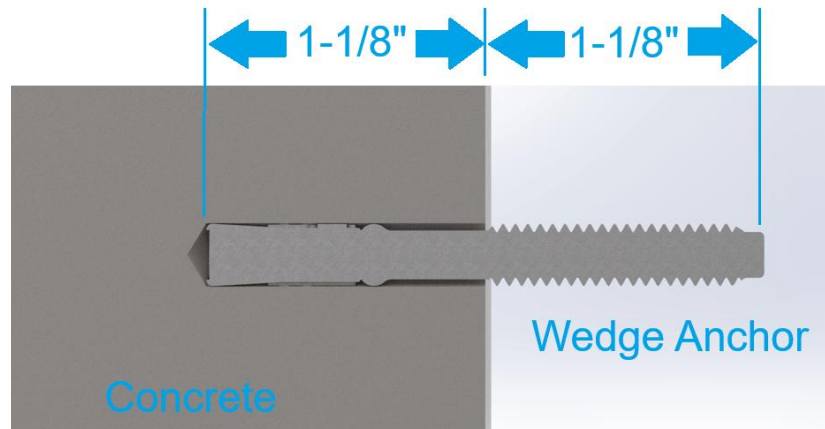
1/4" x 2-1/4" long Wedge Anchor threads protruding out of concrete
